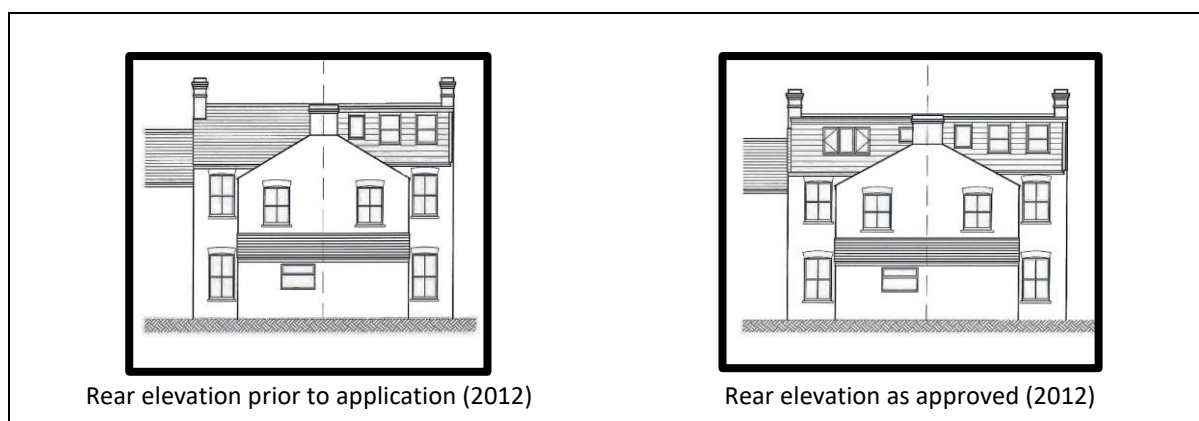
No. 25 Madras Road (left half of building), rear elevation as existing prior to the 2012 application (CCPD)
